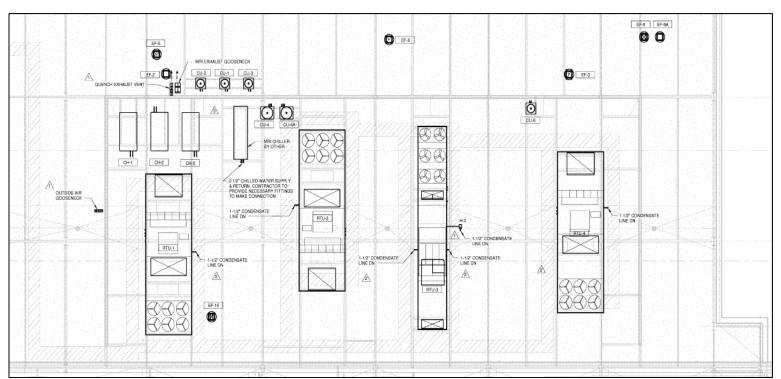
Plan view of Area B's rooftop and the location of the building's major mechanical components. Rooftop units, chillers, exhaust fans, and even the cryogen vent exaust vent. Image courtesy of Ellerbe Becket.
